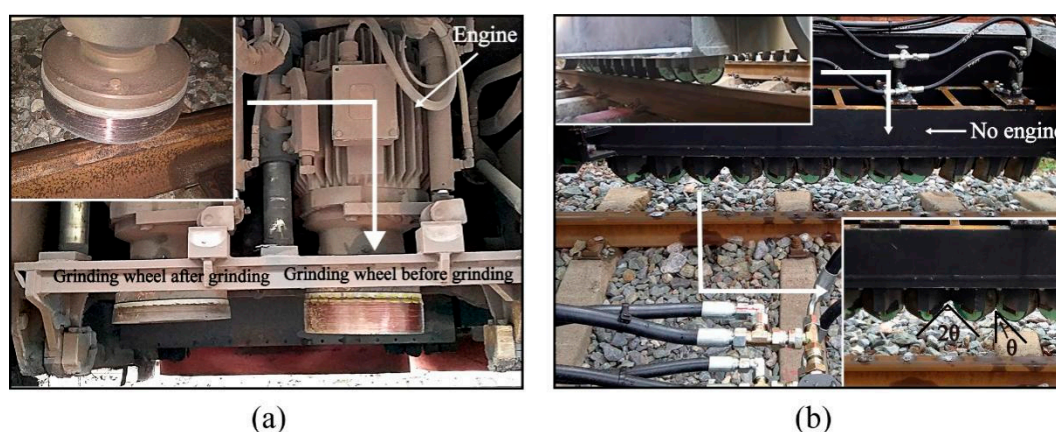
Rail grinding machine, (a) active grinding, (b) passive grinding.
